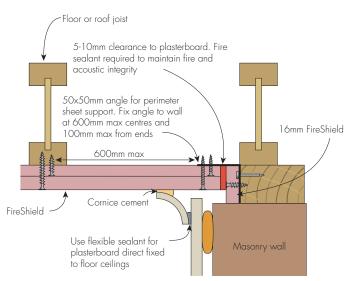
Fire Rated Ceiling to Masonry Wall – Alternate Detail Direct fixed to joist
